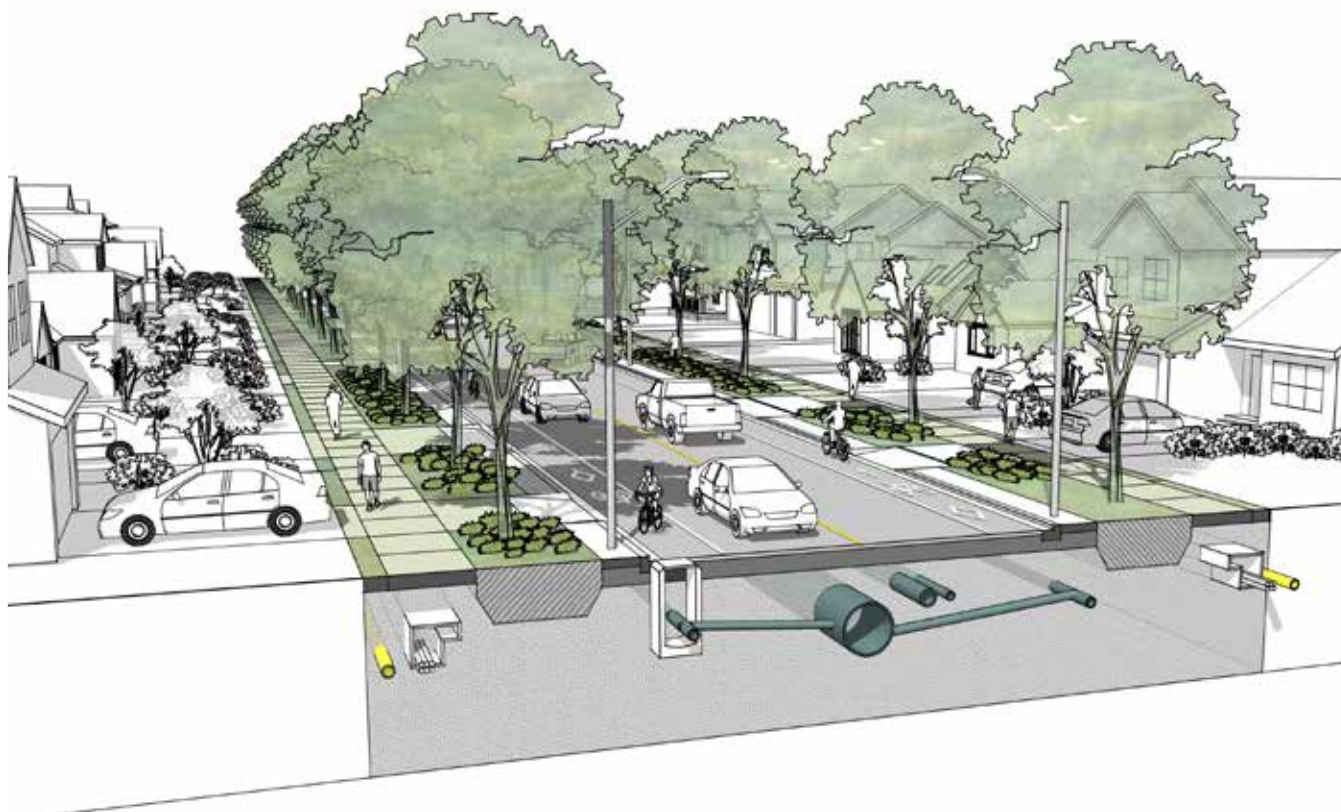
Demonstration of a Neighbourhood Residential Street
